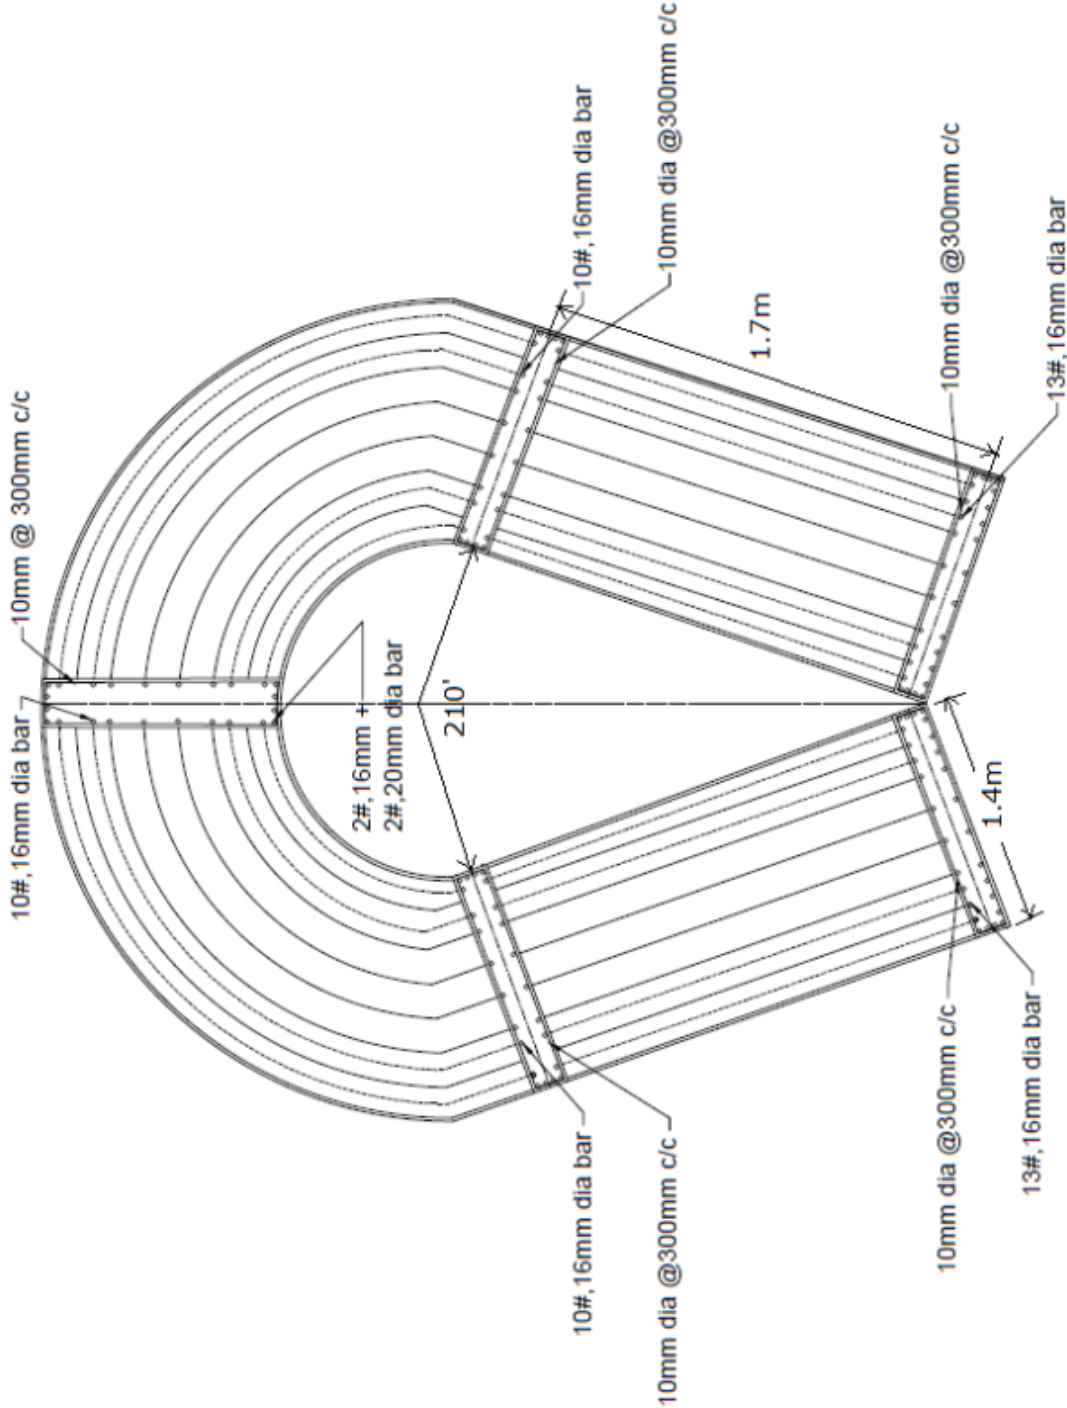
Reinforcement detailing of Horse shoe type of stairs
